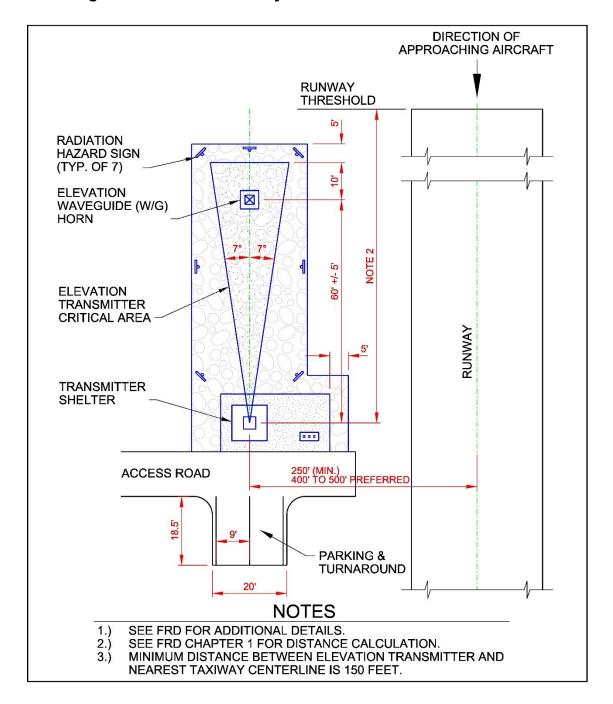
SBICLS Facility: Elevation Station Site Plan
